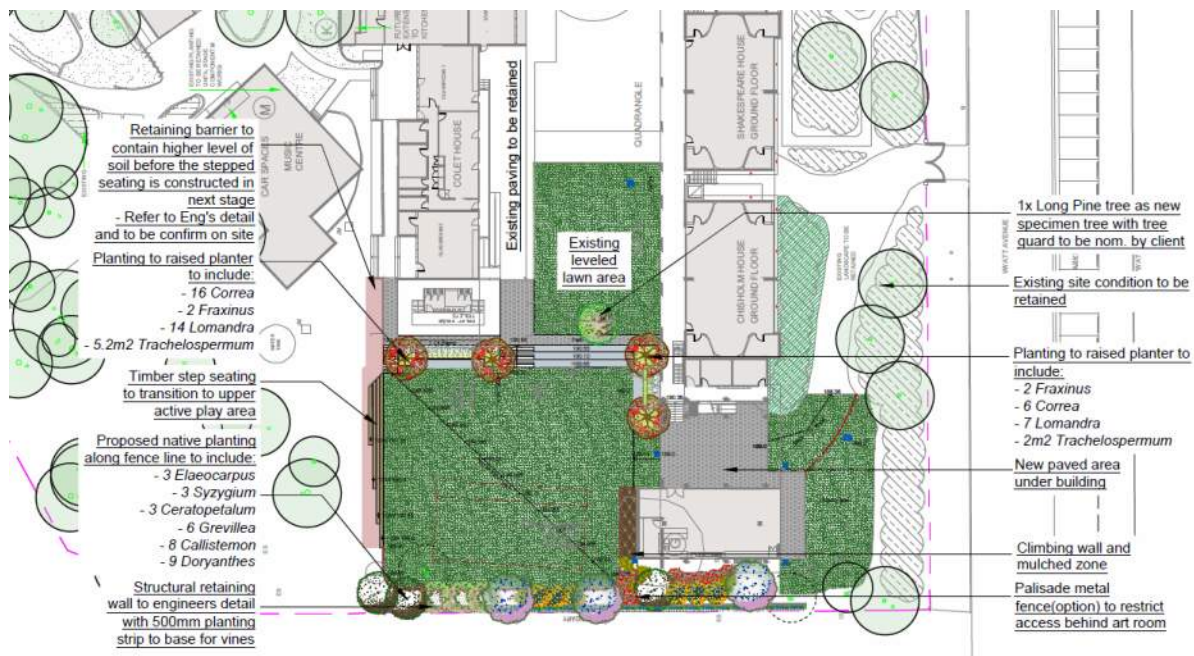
Amended Landscape Plan (Source: Concept Landscape Architects)
